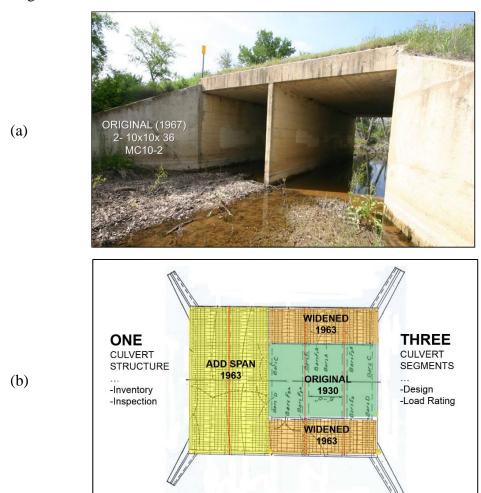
The concept of culvert segments: (a) one-segment culvert and (b) three-segment culvert.
